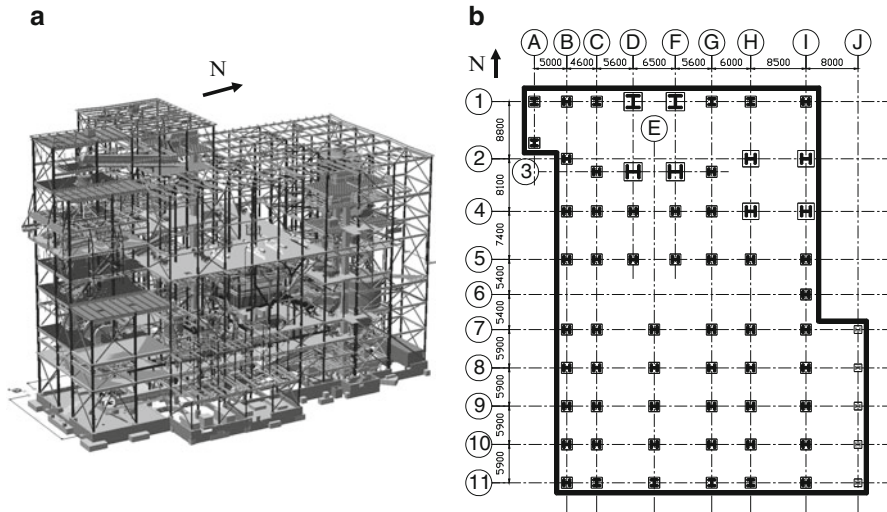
Irregular building studied: (a) three-dimensional view, (b) column layout at the base
